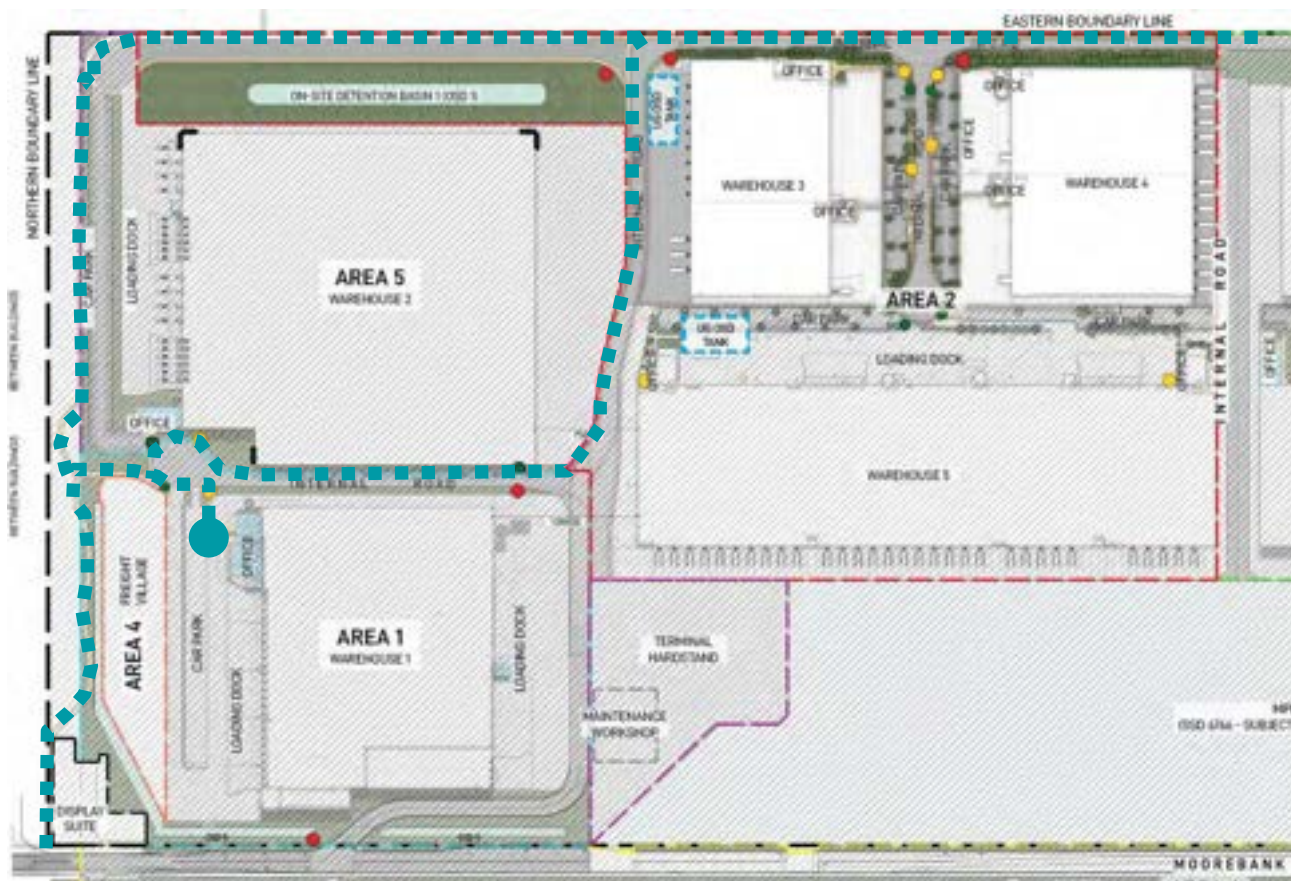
Potential cycling routes to bicycle parking facilities at Warehouse 1 (Ground Ink, 2020).
